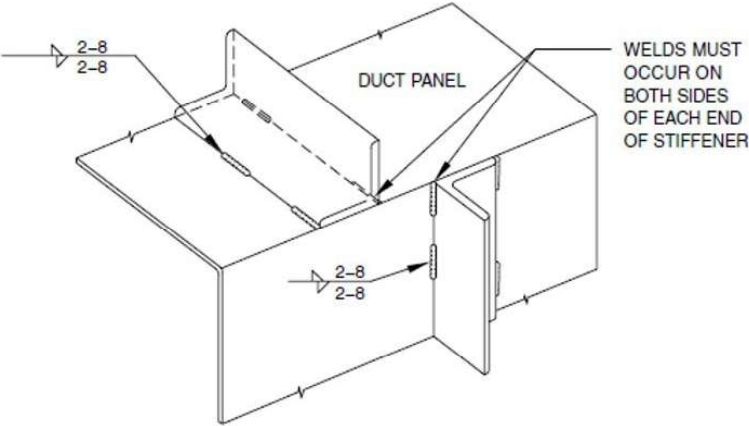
Unfixed Reinforcement Stiffeners (Heel Down)
